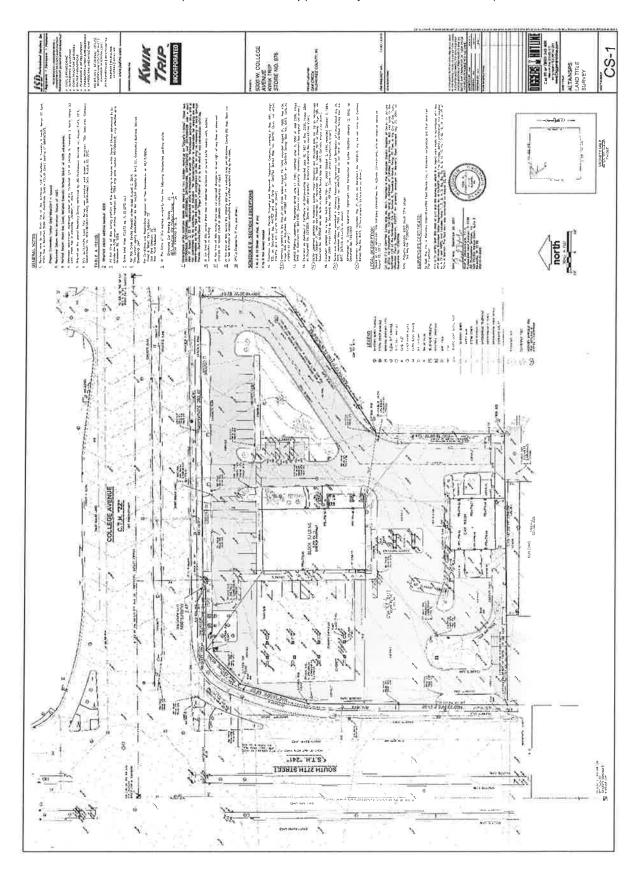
EXHIBIT A: APPROVED SITE PLANS (CONT'D)
